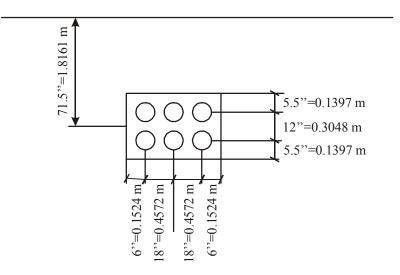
, Assumed trench cross section, three HVDC Light bipolar circuits
